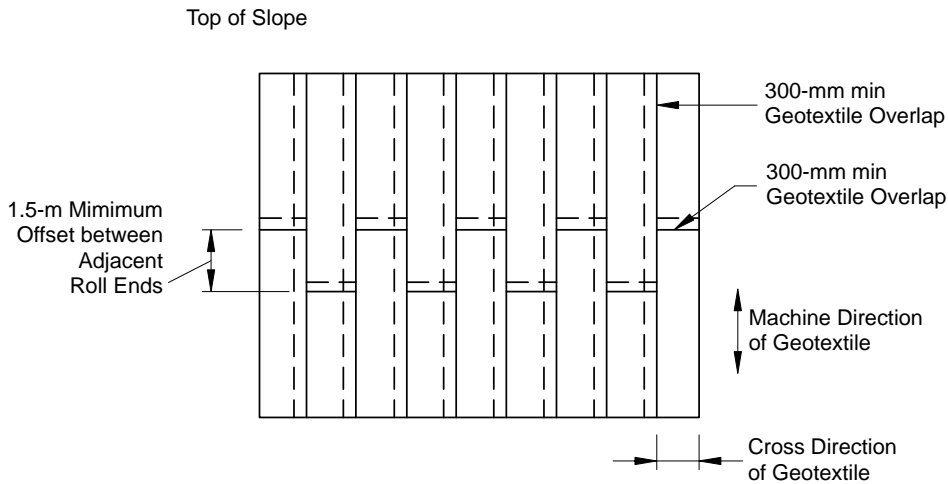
Method of Placing Geotextile for Protection of Cut and Fill Slopes
